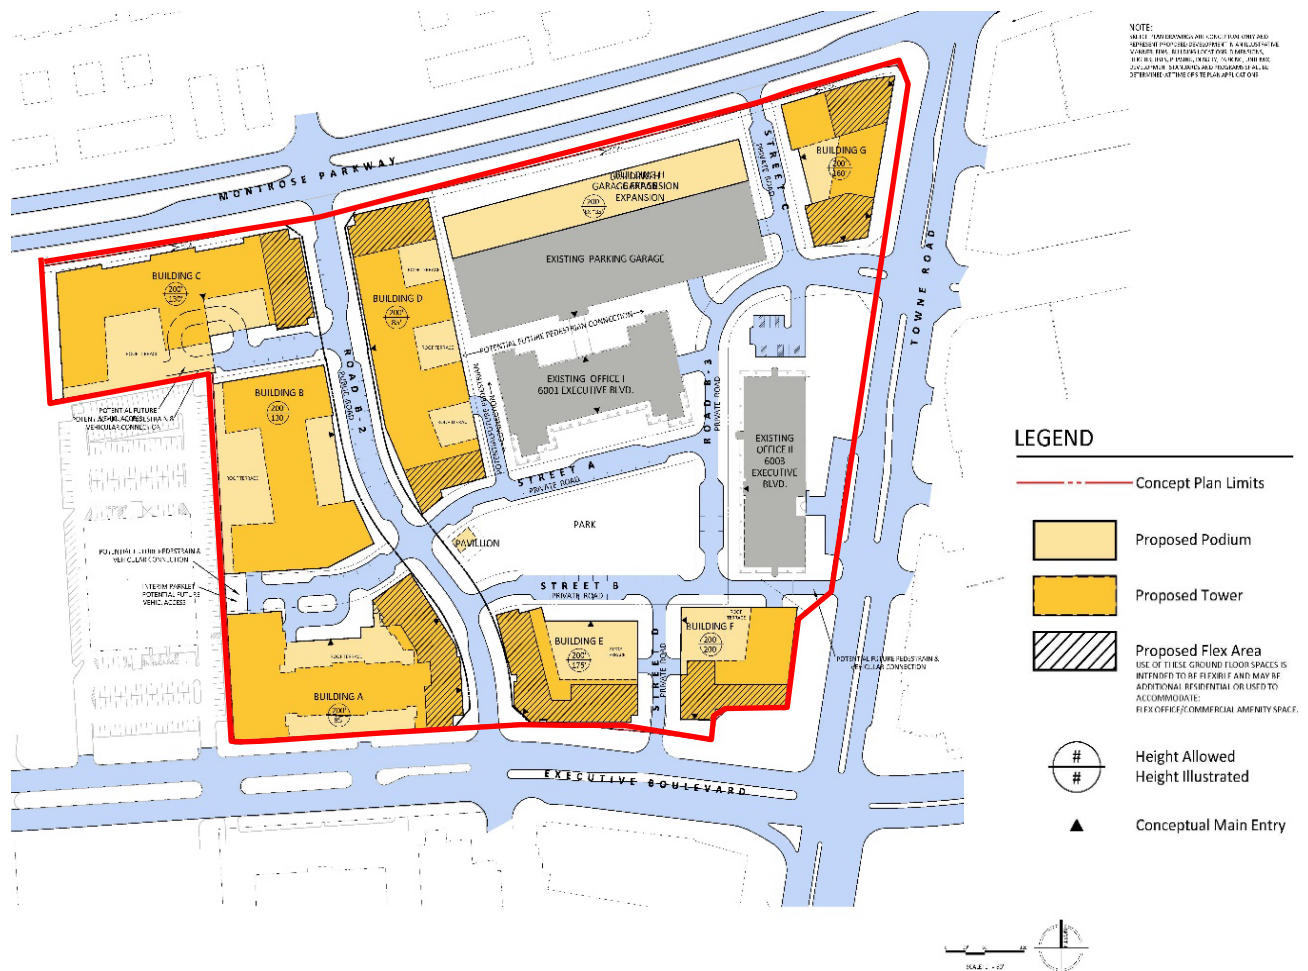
Proposed Sketch Plan (Subject Property outlined in red)
